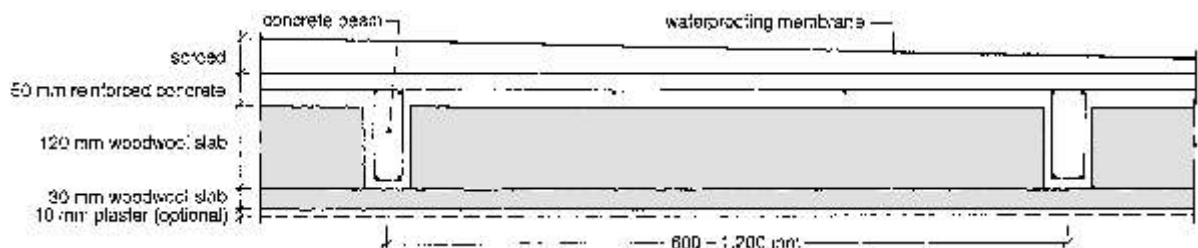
Flat roof consisting of two layers of woodwool slabs. Space is left in the top layer for reinforced concrete beams. These beams and the concrete slab are cast at the same time. The under layer of woodwool slab breaks the thermal bridges created by the concrete beams. The ceiling can either be left as it is, which gives good sound absorption, or plastered. (Using 30 and 120 mm thick woodwool slabs gives a U-value of 0.5 W/m²K).
